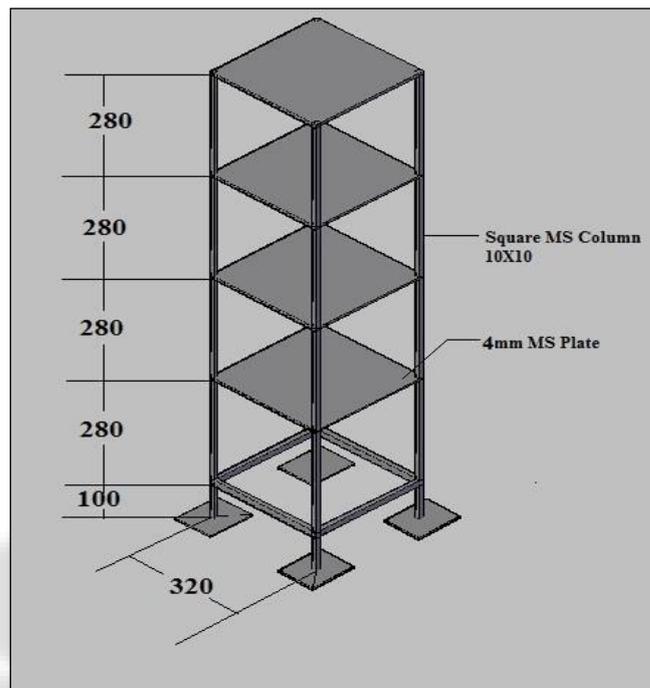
Typical View of G+3 Scale Down Steel Mode
